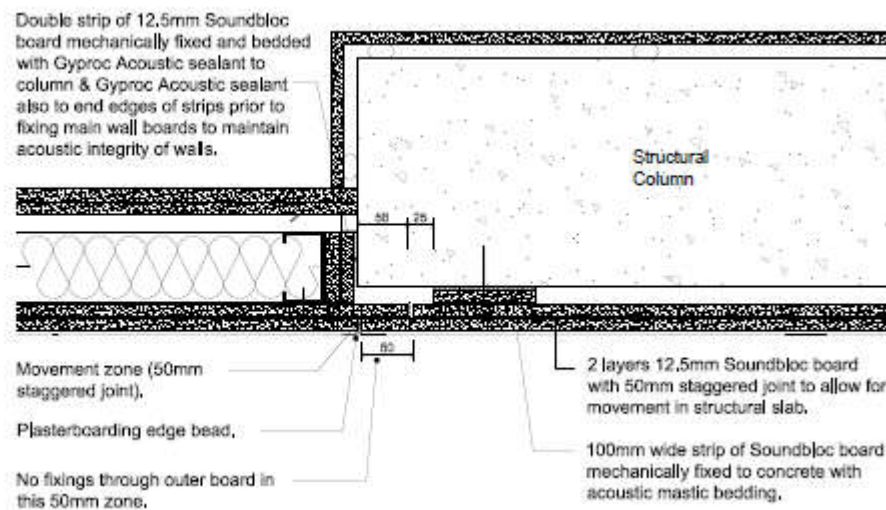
Movement Joint - In Dabbed Plasterboard Fixing to Concrete Column/Wall (Not to Scale)
